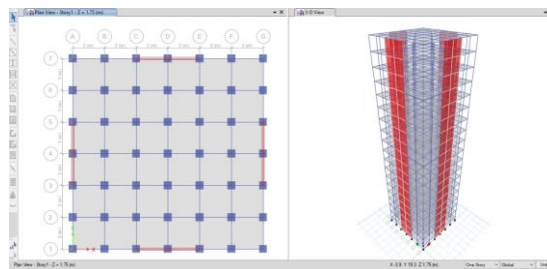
SHEAR WALL AT FOR REGULAR BUILDING
